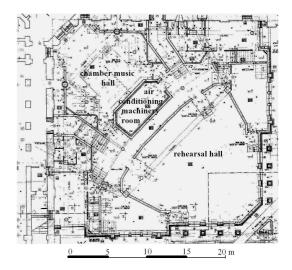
Horizontal section of the building, rehearsal hall and chamber music hall level.
